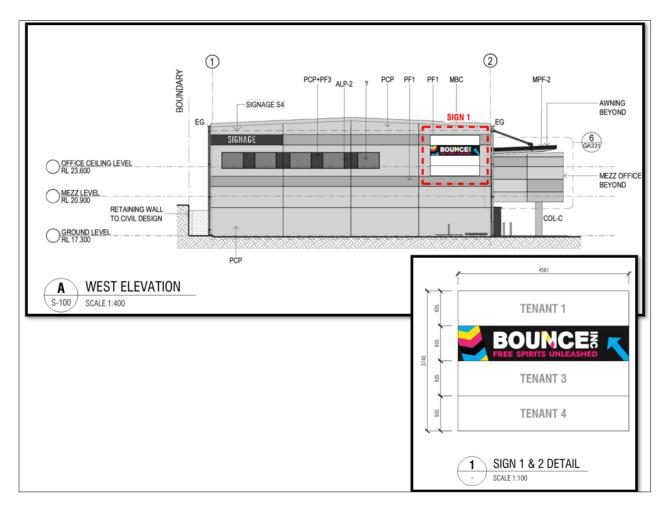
West Elevation - Signage 1 (Source: 2M Creative, 2023)
